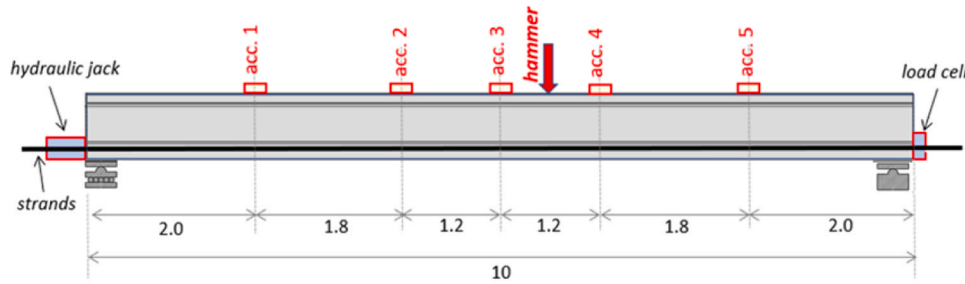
Longitudinal arrangement of the accelerometers for hammer tests carried out on beam-2 at different levels of compression load.
